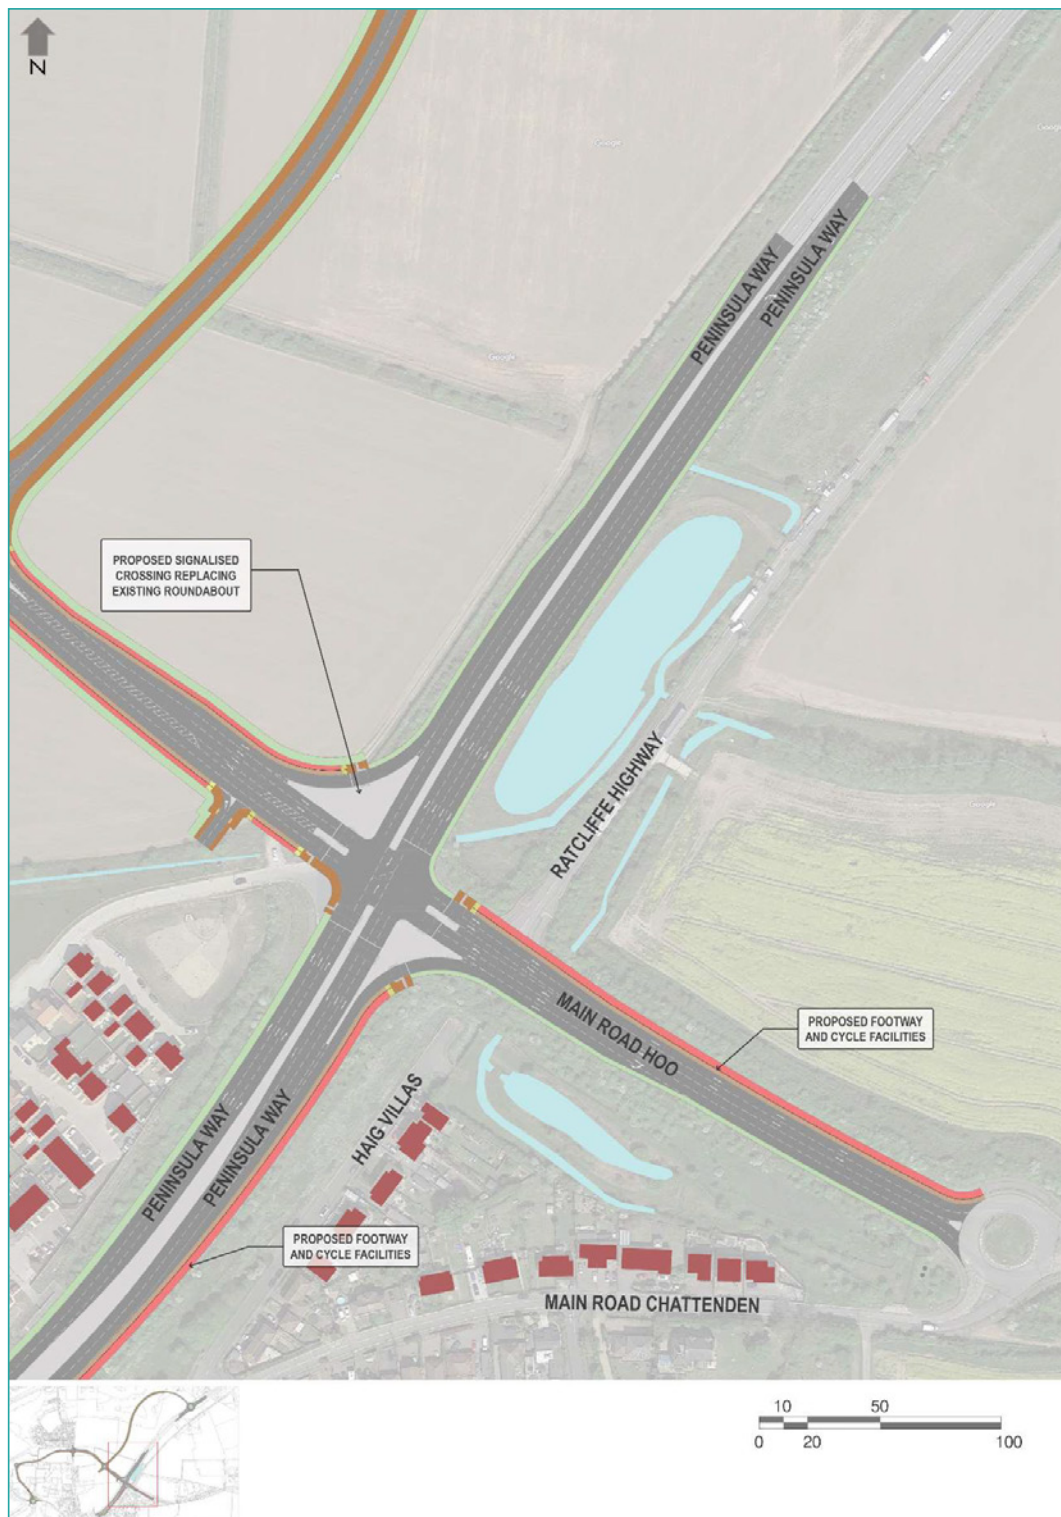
Phase 2 - Proposed A228/Main Road Roundabout junction modification
